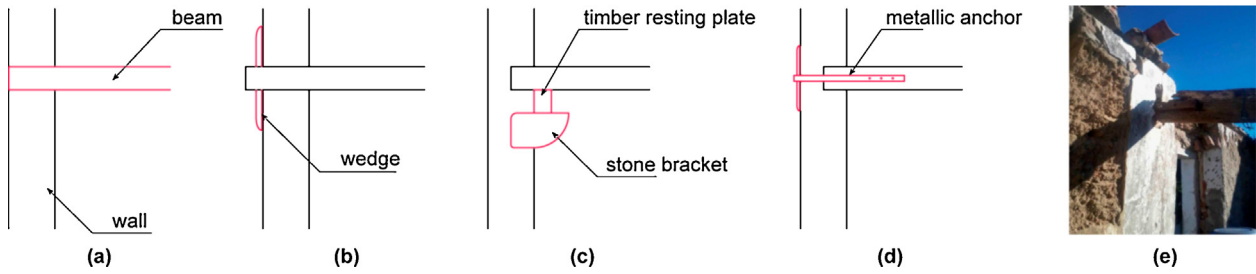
Different types of reinforced floor/roof-to-wall connections: (a) timber beam resting on the whole width of the wall; (b) timber wedges; (c) timber resting plates and stone brackets; (d) metallic anchoring devices; and (e) roof timber beam strengthened with metal bracket in Melides, Portugal (photo by CI-ESG, 2013).
